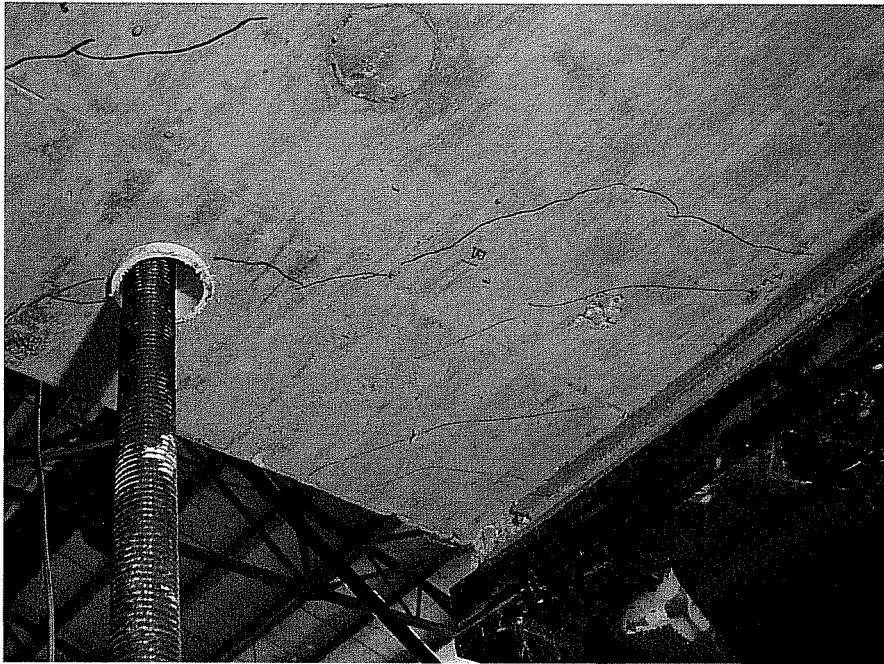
Failure of Overhang Test Area 1, bottom view, facing southwest
